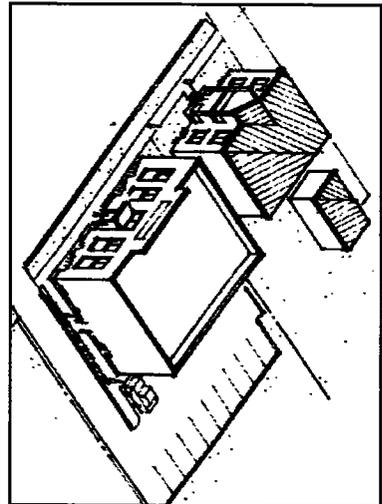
Example of structures in mixed-use district that are located along the 10-foot build-to-line with parking areas sited behind the buildings.
